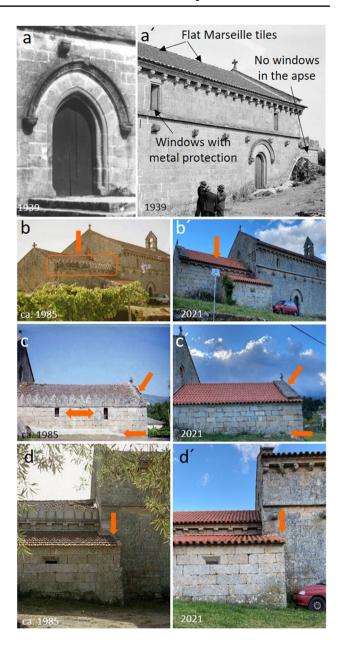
Historical and 2021 photographs showing some of Nossa Senhora de Guadalupe Church renovations throughout the twentieth and twenty-first centuries. a 1939 photograph showing remnants of the whitewash that covered the façades of the church. (a') 1939 photograph showing the Marseilles flat roof tiles introduced between the late nineteenth and early twentieth centuries. The windows of the nave were protected with a metal net. Note that no windows are visible in the apse wall. b and (b') General view of the church from the northeast. b: Photograph from circa 1985. Battlements with triangular merlons of granite in the apse (crowning the SE and NW façades). Note that the triangular merlons located immediately above the sacristy have less biological colonisation, so they are possibly more recent. The tiles are of Marseille type. c Photograph from circa 1985. Detail of the apse with triangular-shaped battlements and two windows in the SE façade of the apse. (c') Bricked up window in the apse with a different granite of original building stones. No triangular merlons are in the apse. d Photograph from circa 1985. Sacristy with a flat-tile roof and zinc plate flashings. (d') 2021 photograph. Mixed tiles on the rooftops
